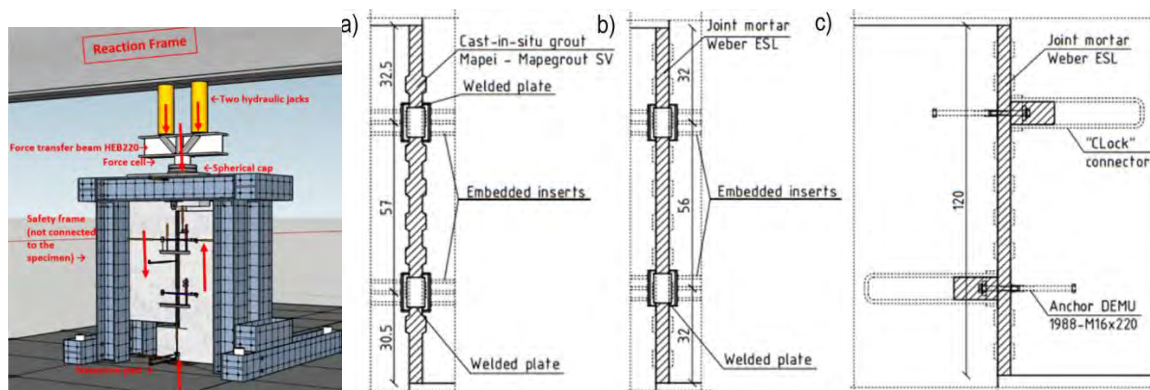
Push-off test setup; Test specimens details [in cm] a) specimens SA1; b) specimens SA2; c) specimens SA3;
